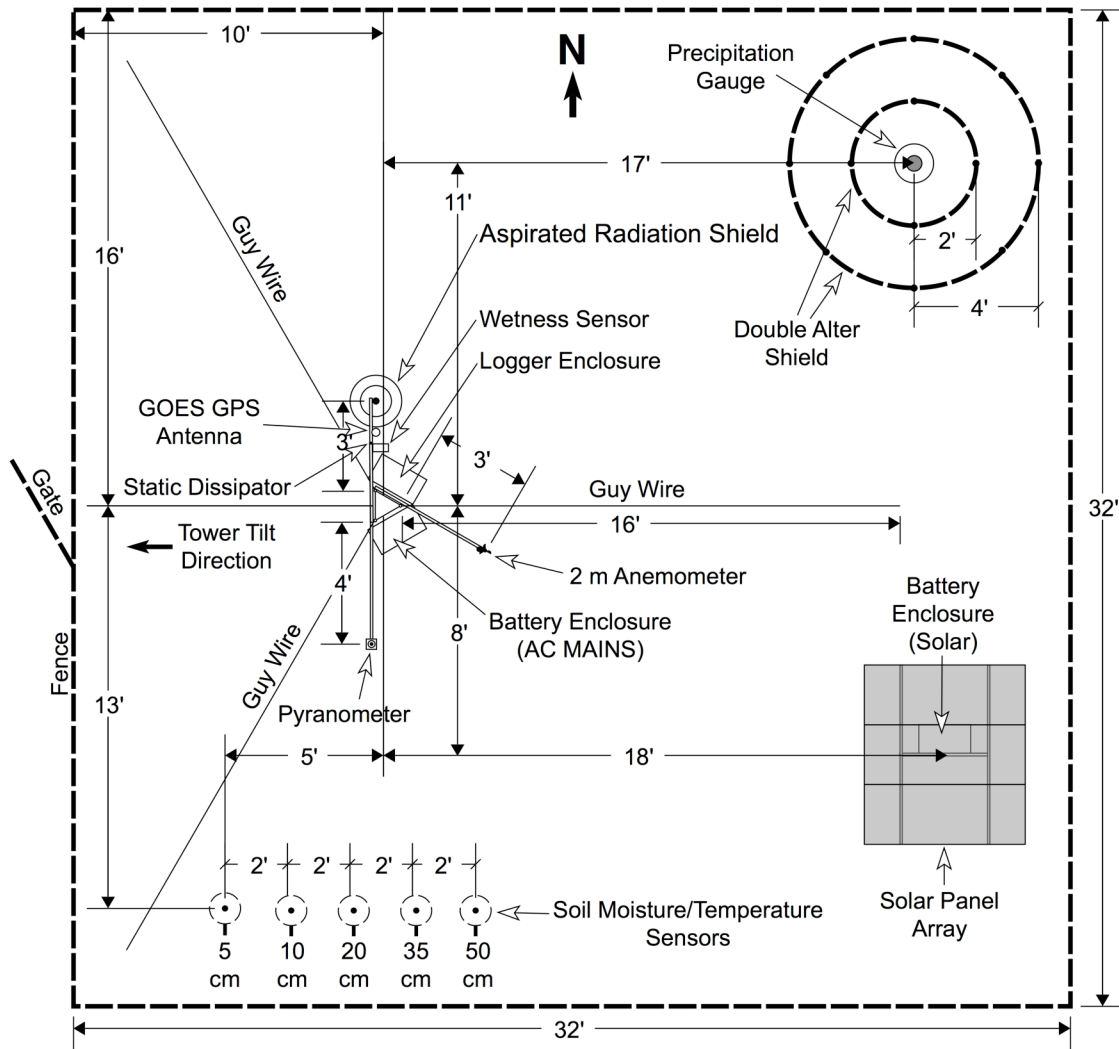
Plan view of a station plot that measures 32-by-32 feet and has a tall tower.
